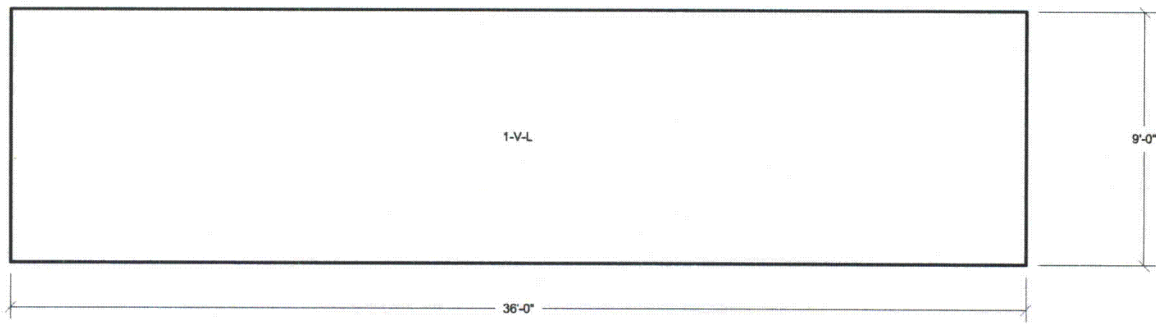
H.7-11: Tunnel Walls Looking From Outside
